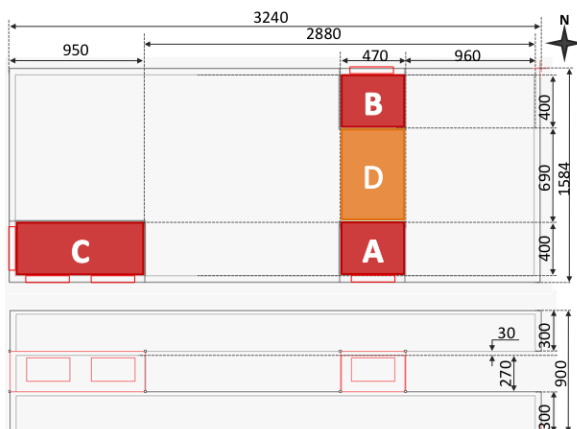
Reference building floor plan with indication of simulated zones - 2nd floor
